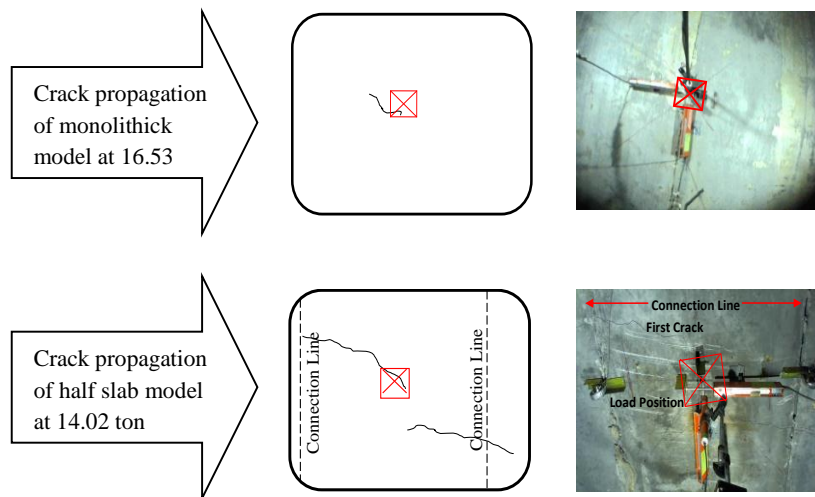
Initial crack of Monolithic and Half Slab Model at crack load
